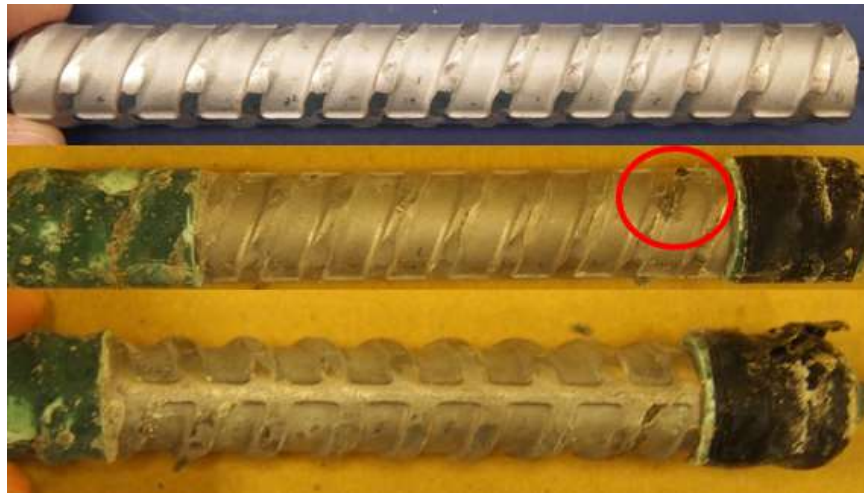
RST 7.5-400 Batch – XM-28 AR 8.2 Corrosion Products causing Cracking of Concrete Specimen
